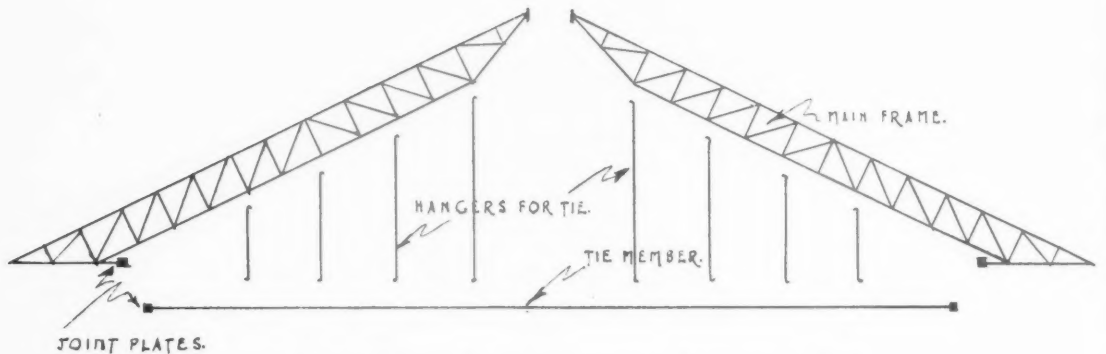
Composite roof truss for spans ranging from 30' to 120'.
